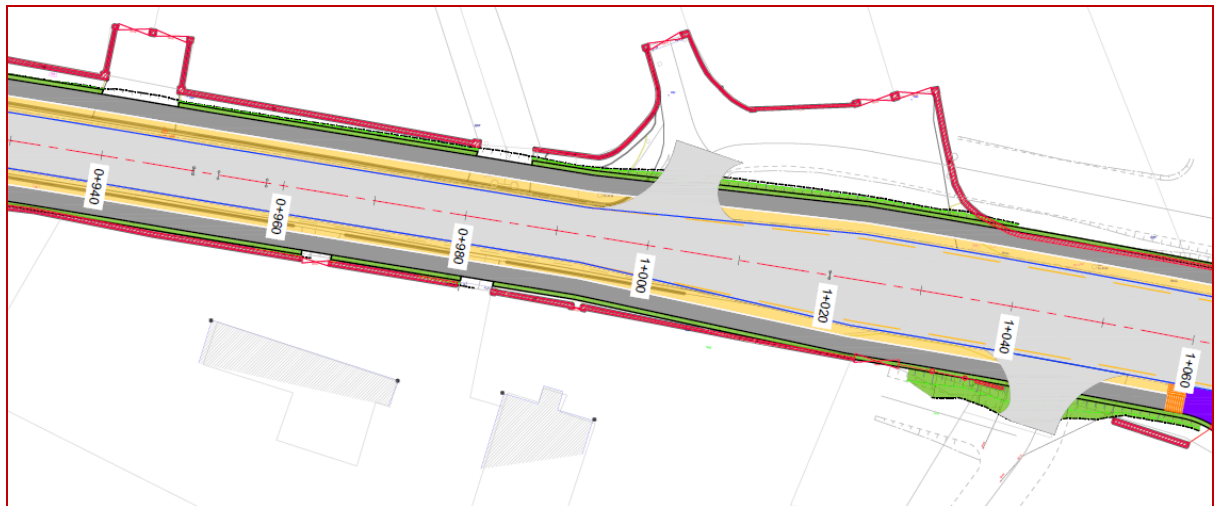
Typical Layout of One-Way Cycle Facility Crossing at Direct Accesses and Junctions
